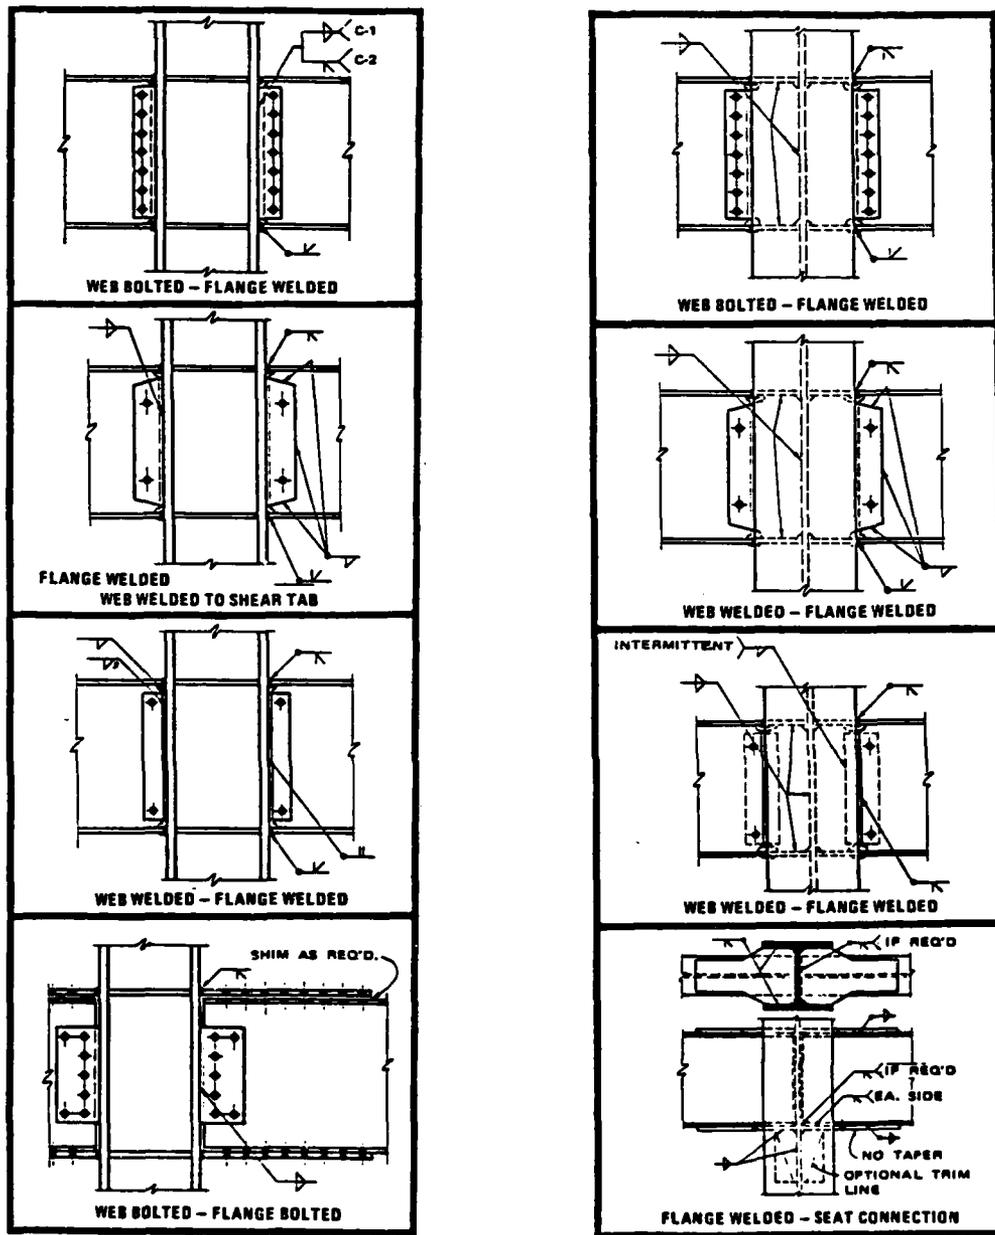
Moment Connections - Beam to Column Web. (Ref. 24)
